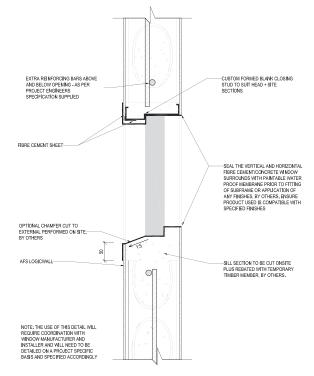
Commercial Window Section Detail – Rebated Head Reveal
